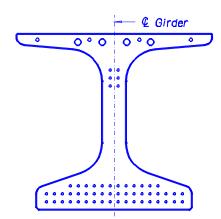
Cross-Section of NU 1800 (1800 mm High) Girder with four 1-3/8" threaded rods
